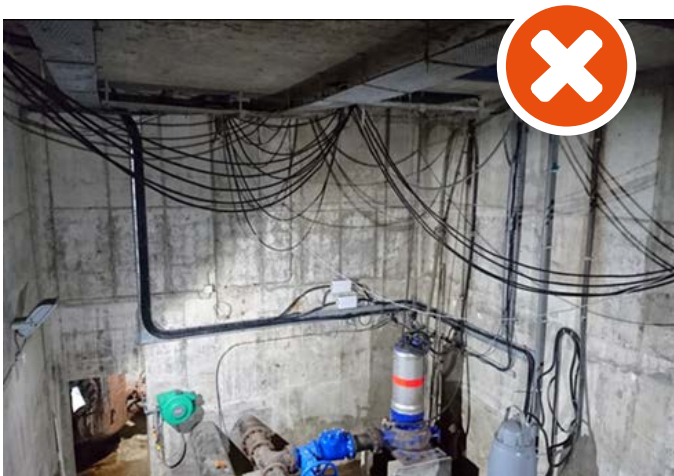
Example of poor cable planning, routing and management: In an existing facility, cable containment was found to be inadequate for the site's requirements. This led to the risk of damage to cables and risks to safe access, future safe use and future maintenance.
